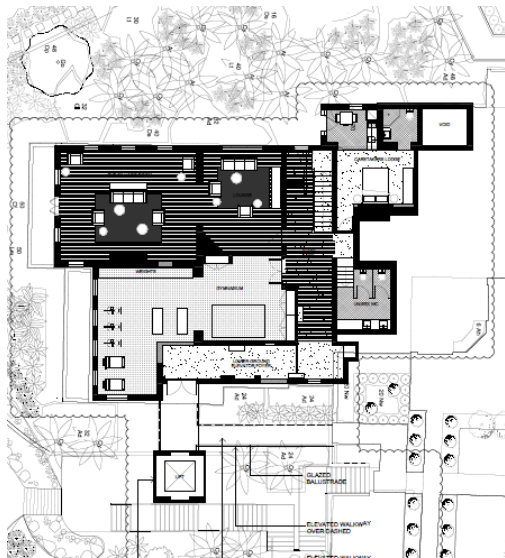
Proposed revised layout at Level 1 of 1 Avon Road
